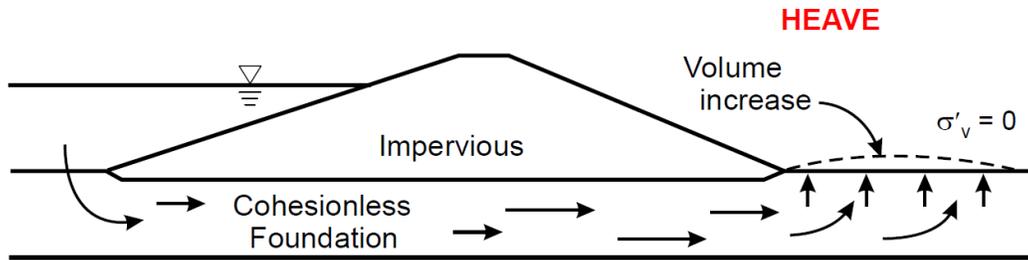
Heave at the Toe of an Embankment (Pabst et al. 2012)
